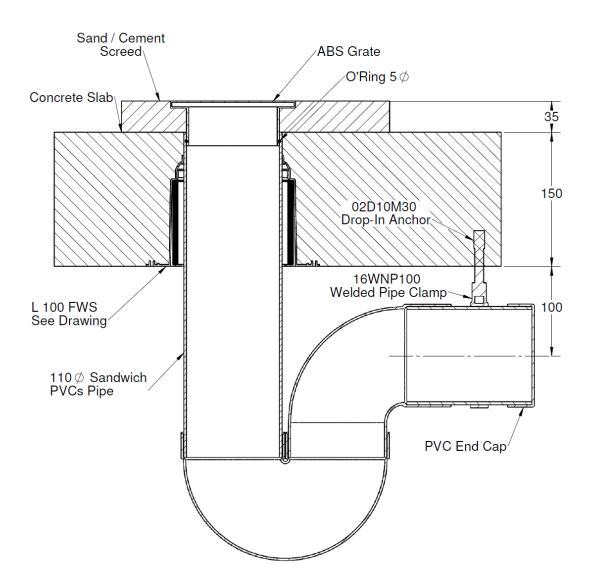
Specimen 6. 100 mm Ø PVCU Floor Waste with L 100 FWS Cast-in Collar
